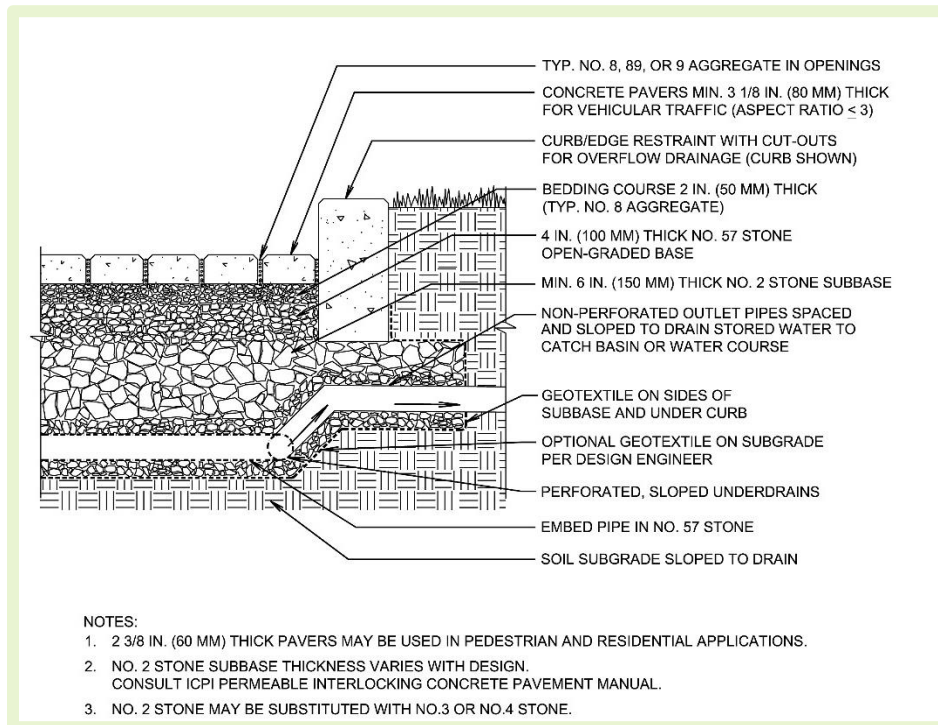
Permeable pavers with detail of underdrain in aggregate trench with upturned elbow (Credit: ICPI)
